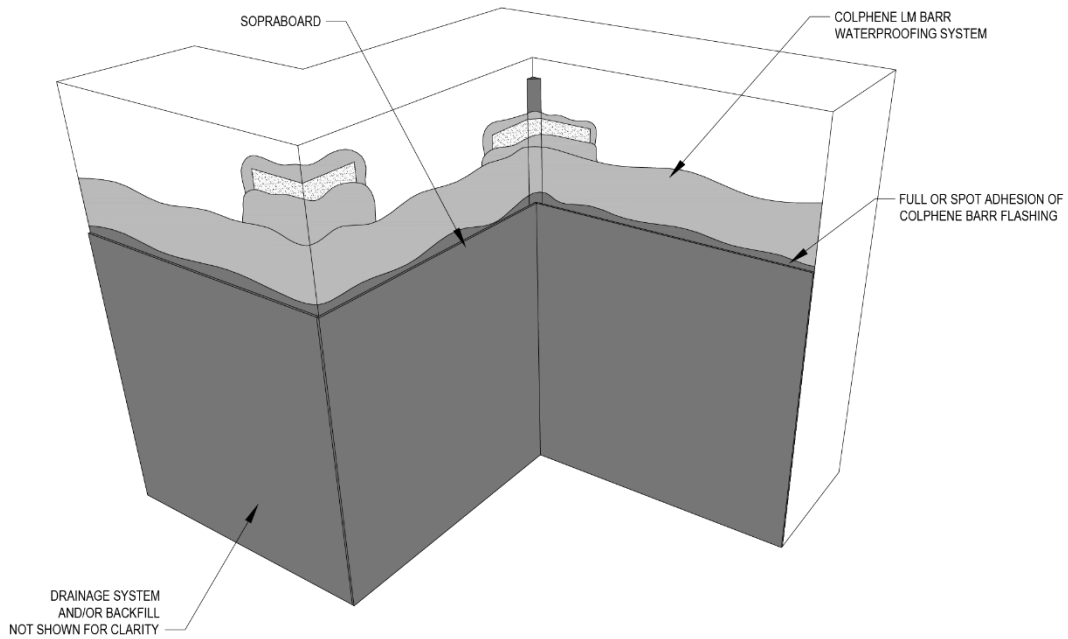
SOPRABOARD™ Protection Course At Inside/Outside Corners
